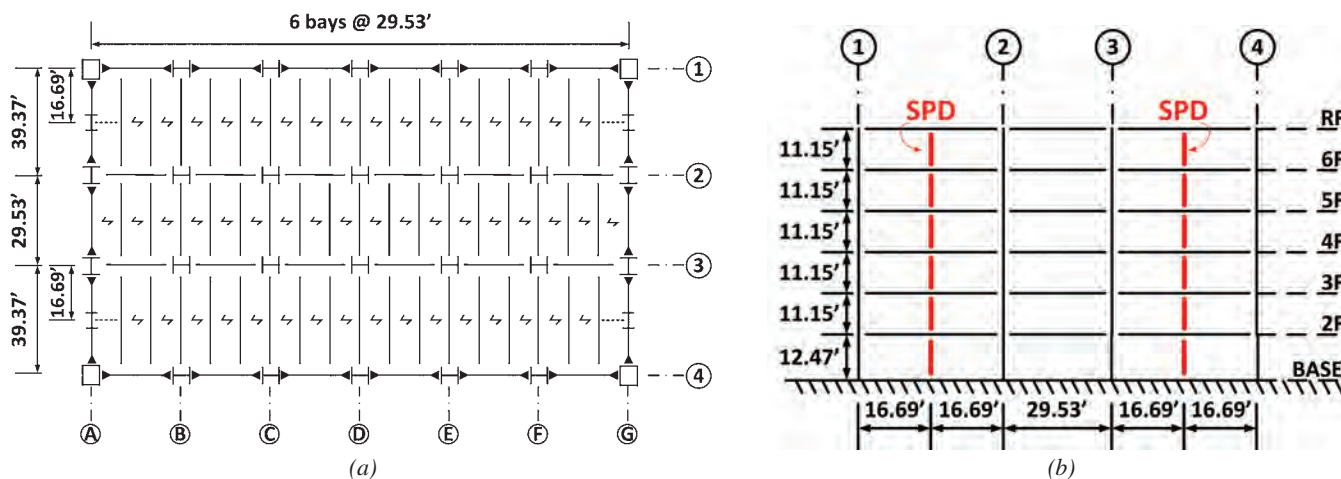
(a) Floor framing plan; (b) transverse frame elevation.
